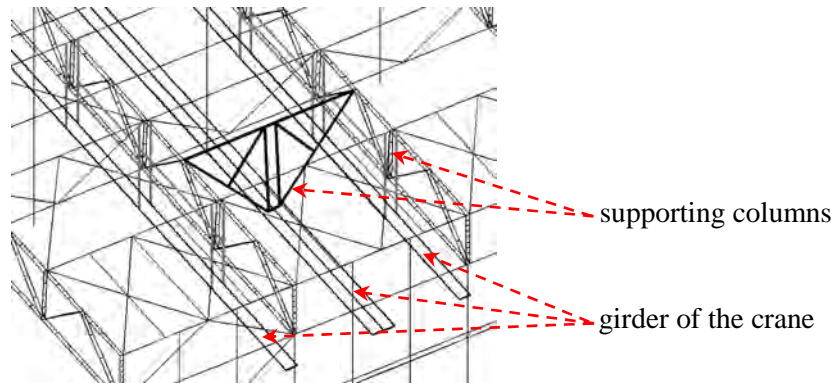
Scheme of the purlines supporting by the brace struts situated on the girder of the bridge crane
